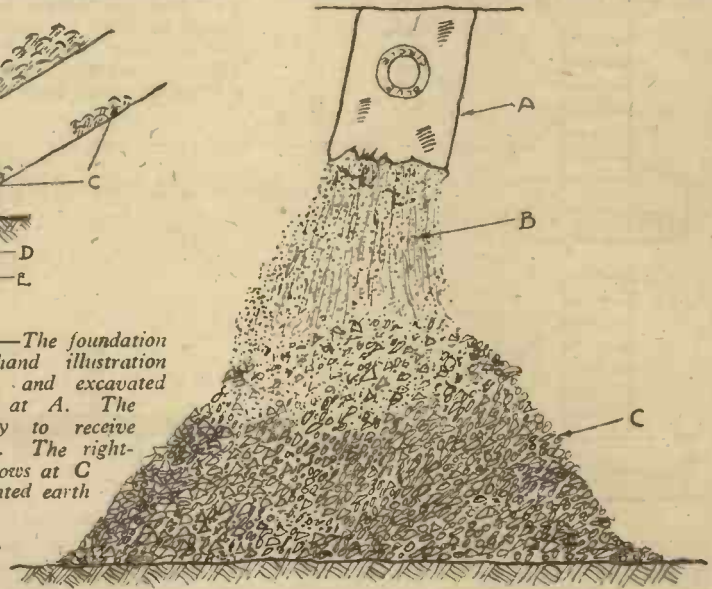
(Right).—"Sprinkled or floured ballast concrete." A, Cement bag out of which is tipped cement B, which sprinkles or "flows" part of heap of ballast C, the result being a mixture which is usually proportioned wrongly and causing a very weak concrete.
